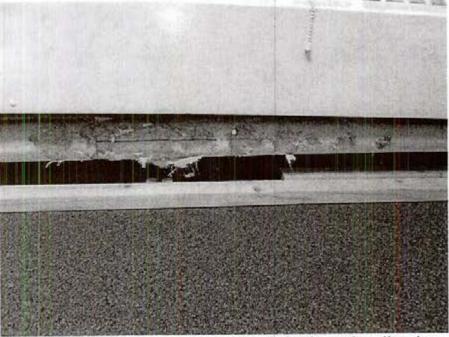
Damaged Thermal System Insulation beneath wall register of West Wall of Room 107.
